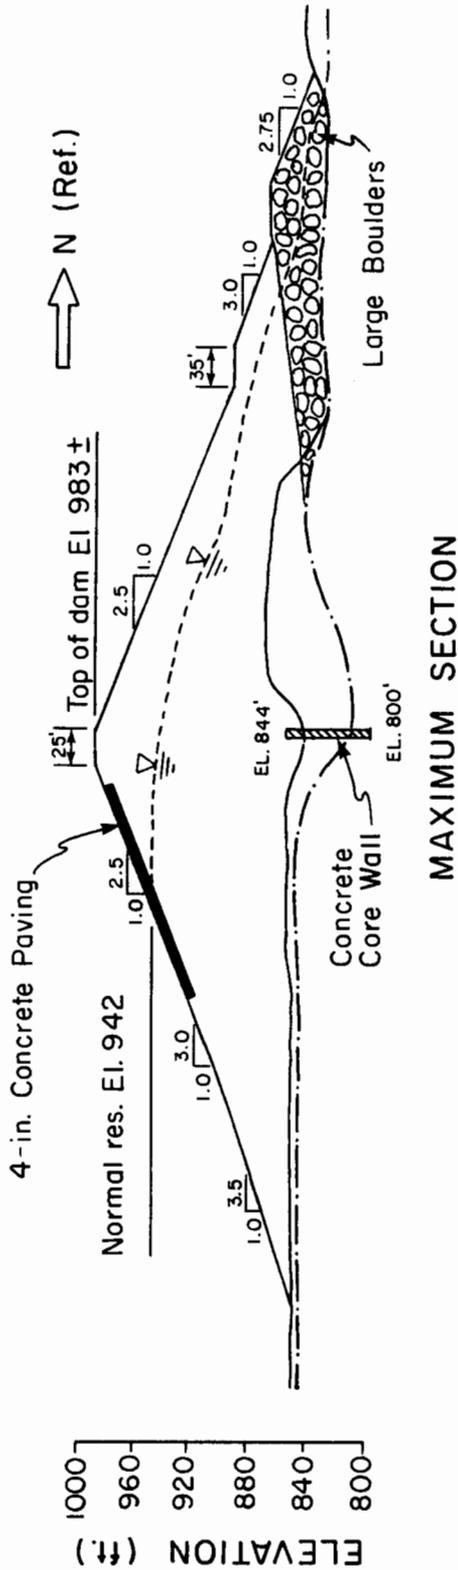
CROSS-SECTION THROUGH THE MAXIMUM HEIGHT SECTION OF THE MAIN PUDDINGSTONE DAM (DAM NO. 1)
